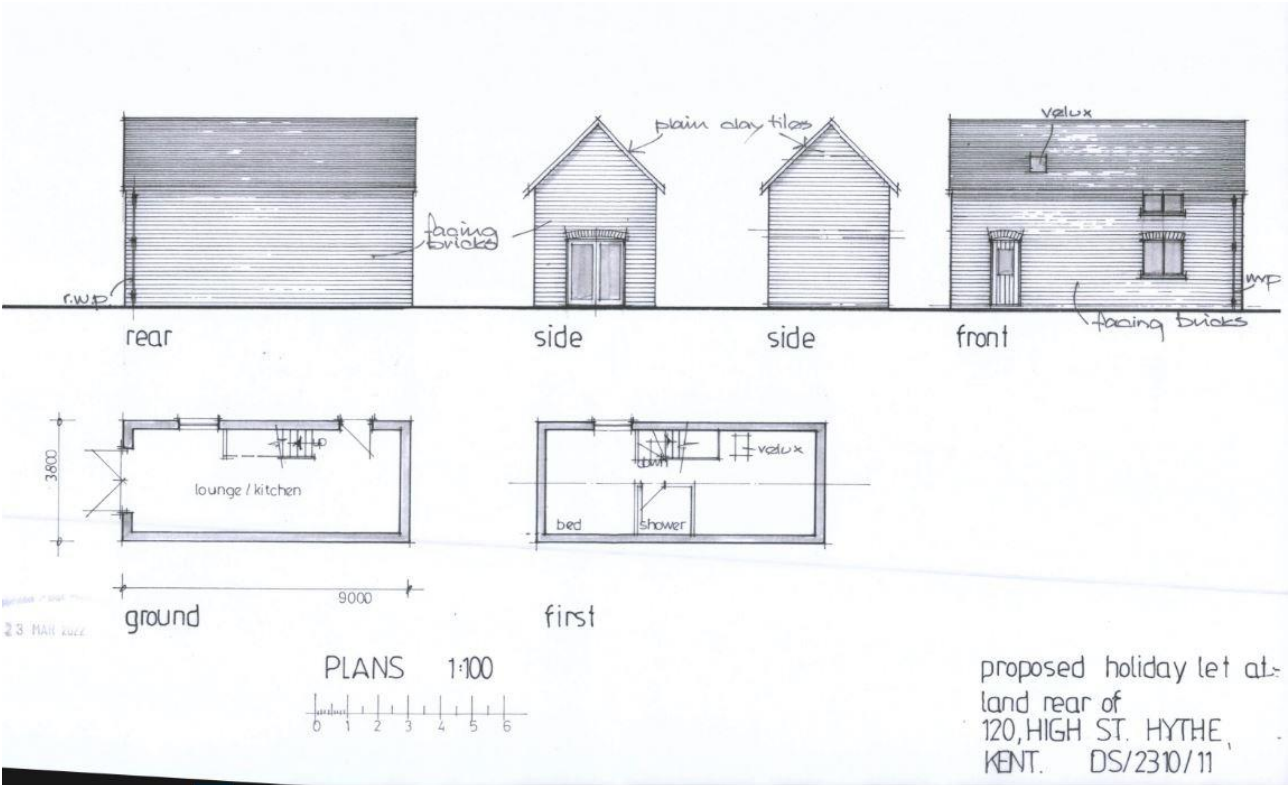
Proposed Elevations and Floor Plans to Holiday Let
